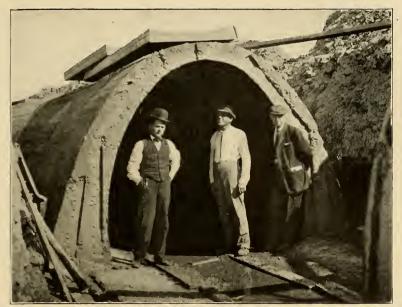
Main Intercepting Sewer. 90-inch Section. Shallow Trench.
